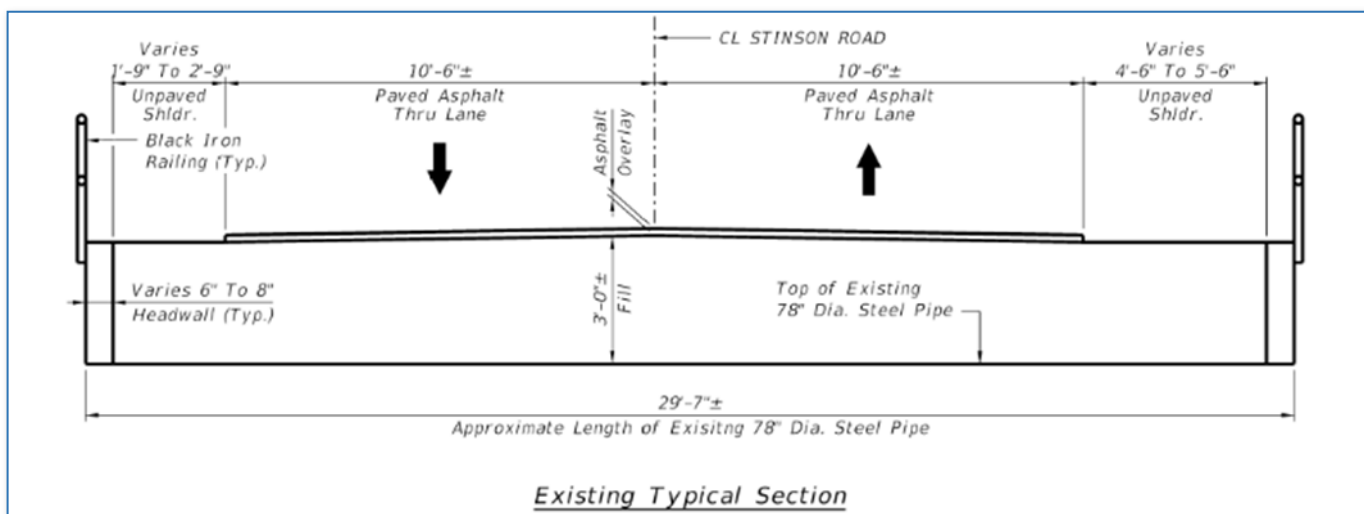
Stinson Rd Typical Section at Muddy Creek
